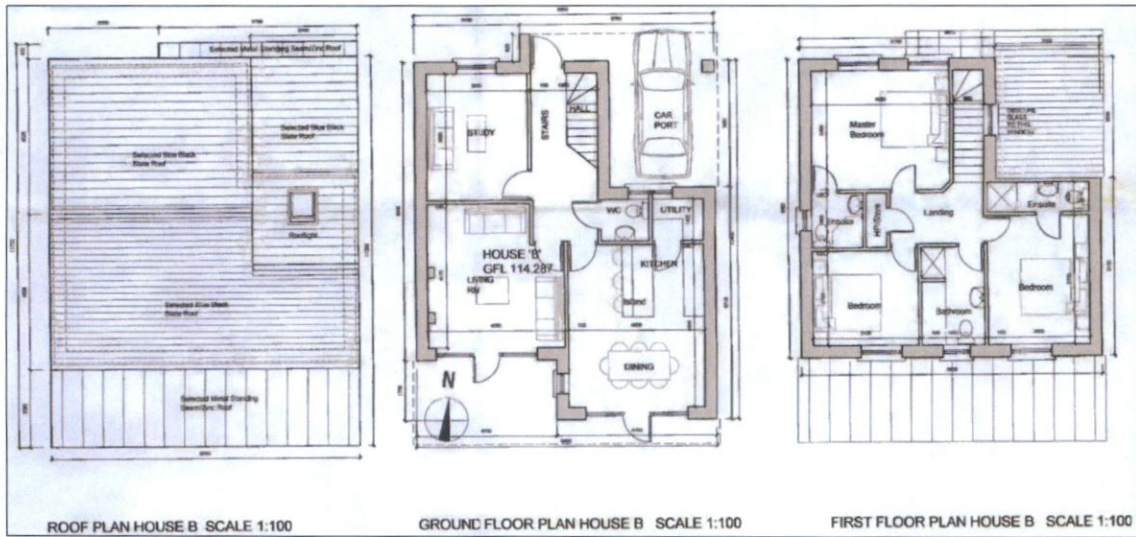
Floor plans of House B as refused under Reg. Ref. SD18A/0138 and ABP Ref.302075-18.
